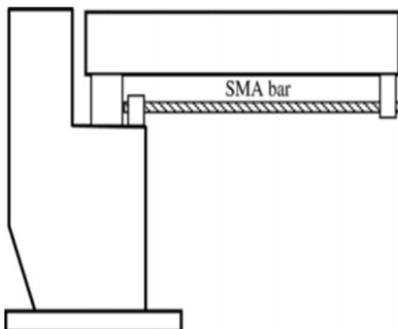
Schematic of the setup of SMA restrainer for a simple-supported bridge.
